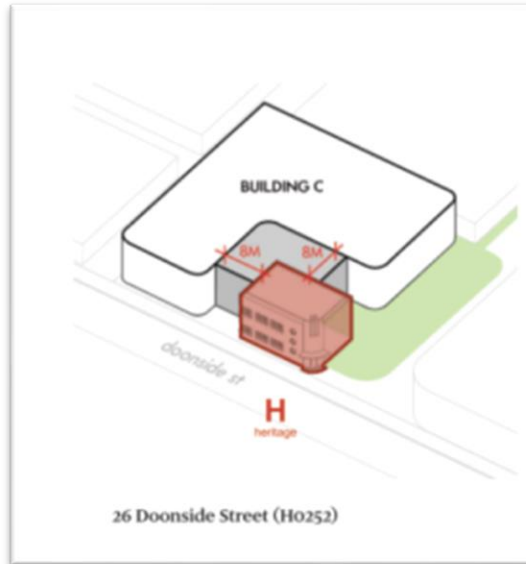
Setbacks of Building C from heritage fabric Source: Development Plan (Gurner 2023)
